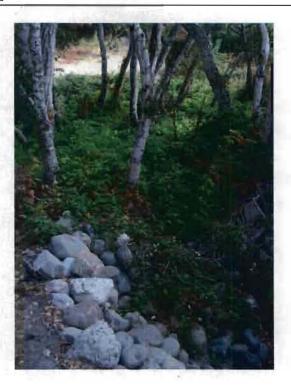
30/40 Ryan Ranch Court – A single straw wattle BMP had been installed to dissipate flow from drainage ditch. The wattle is not visible in this photo.
